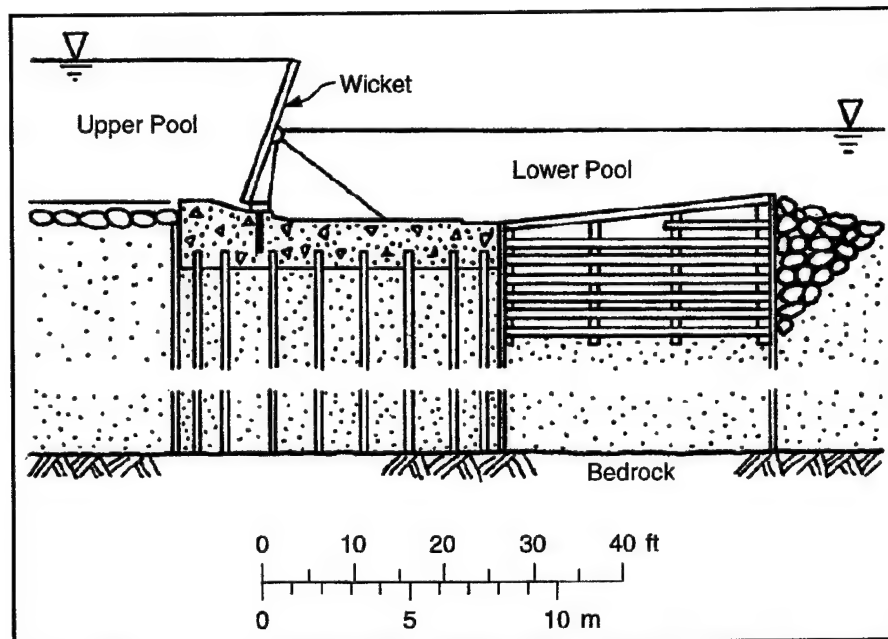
Typical section of a navigable pass portion of a wicket dam
